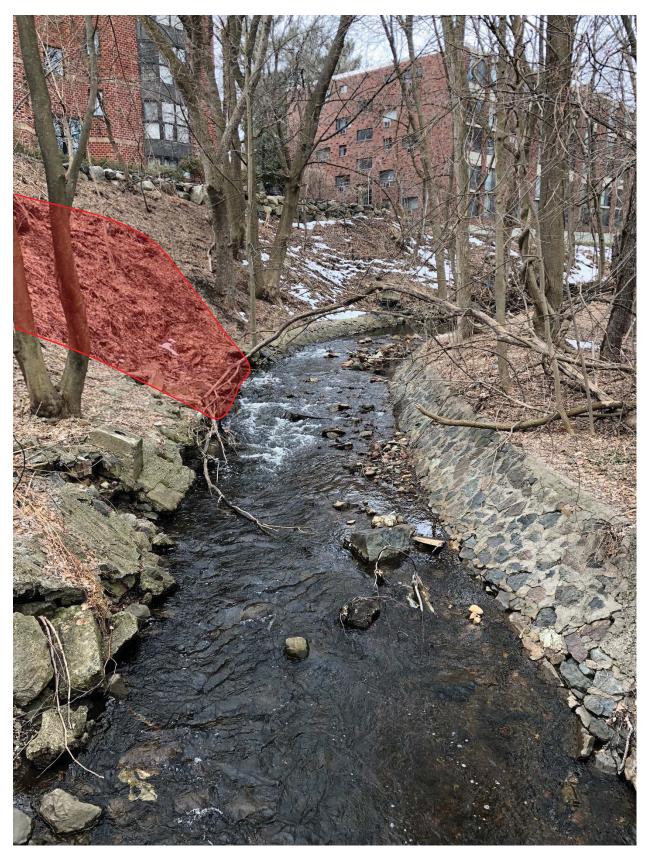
Looking west toward south bank and "Erosion-1B". (Private property)
